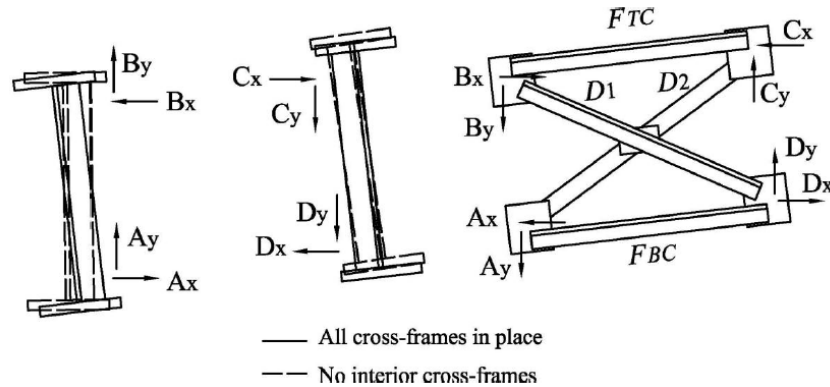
Internal forces in girders and cross-frames due to skew effects (Sanchez, 2011).
